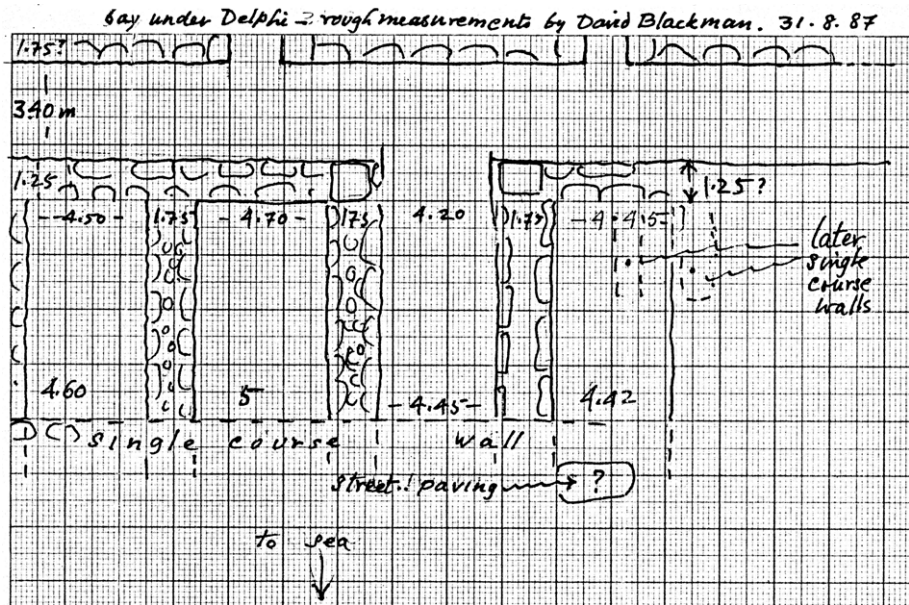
Plan of remains at Kirrha (HF and DJB: 31/8/87).
